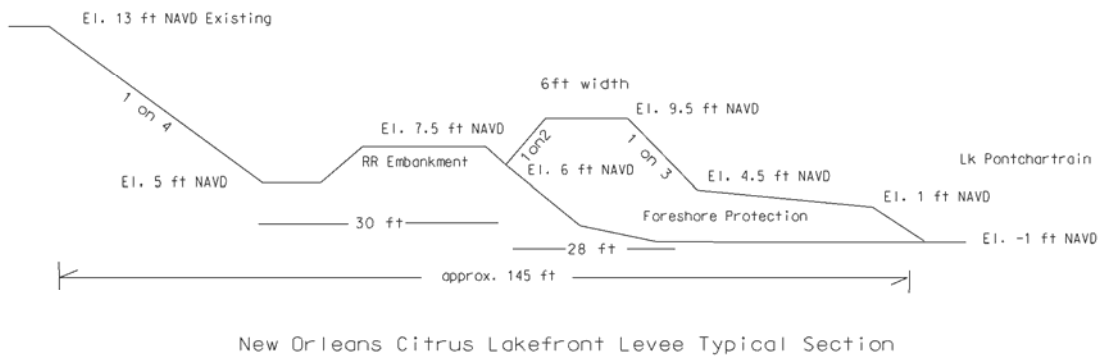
Current Cross-Section Profile Citrus Lakefront Levee (NE01).
